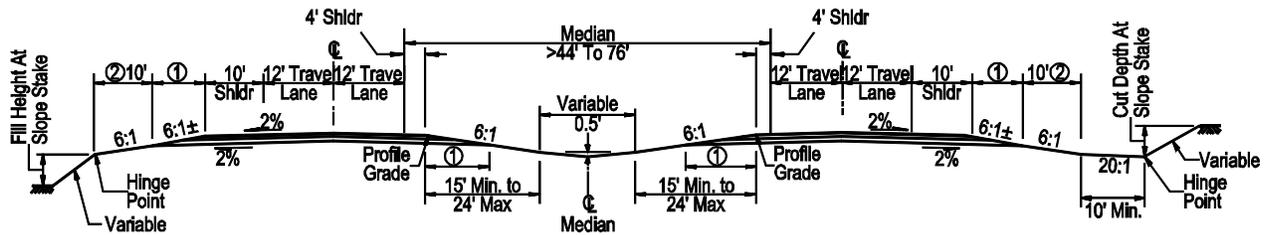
Typical Freeway with Depressed Median Section (Superelevated Section)
